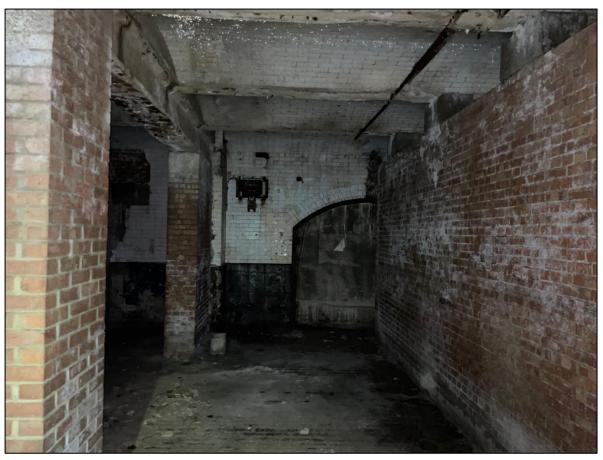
View of the later basement with white tiled walls constructed circa 1930s
